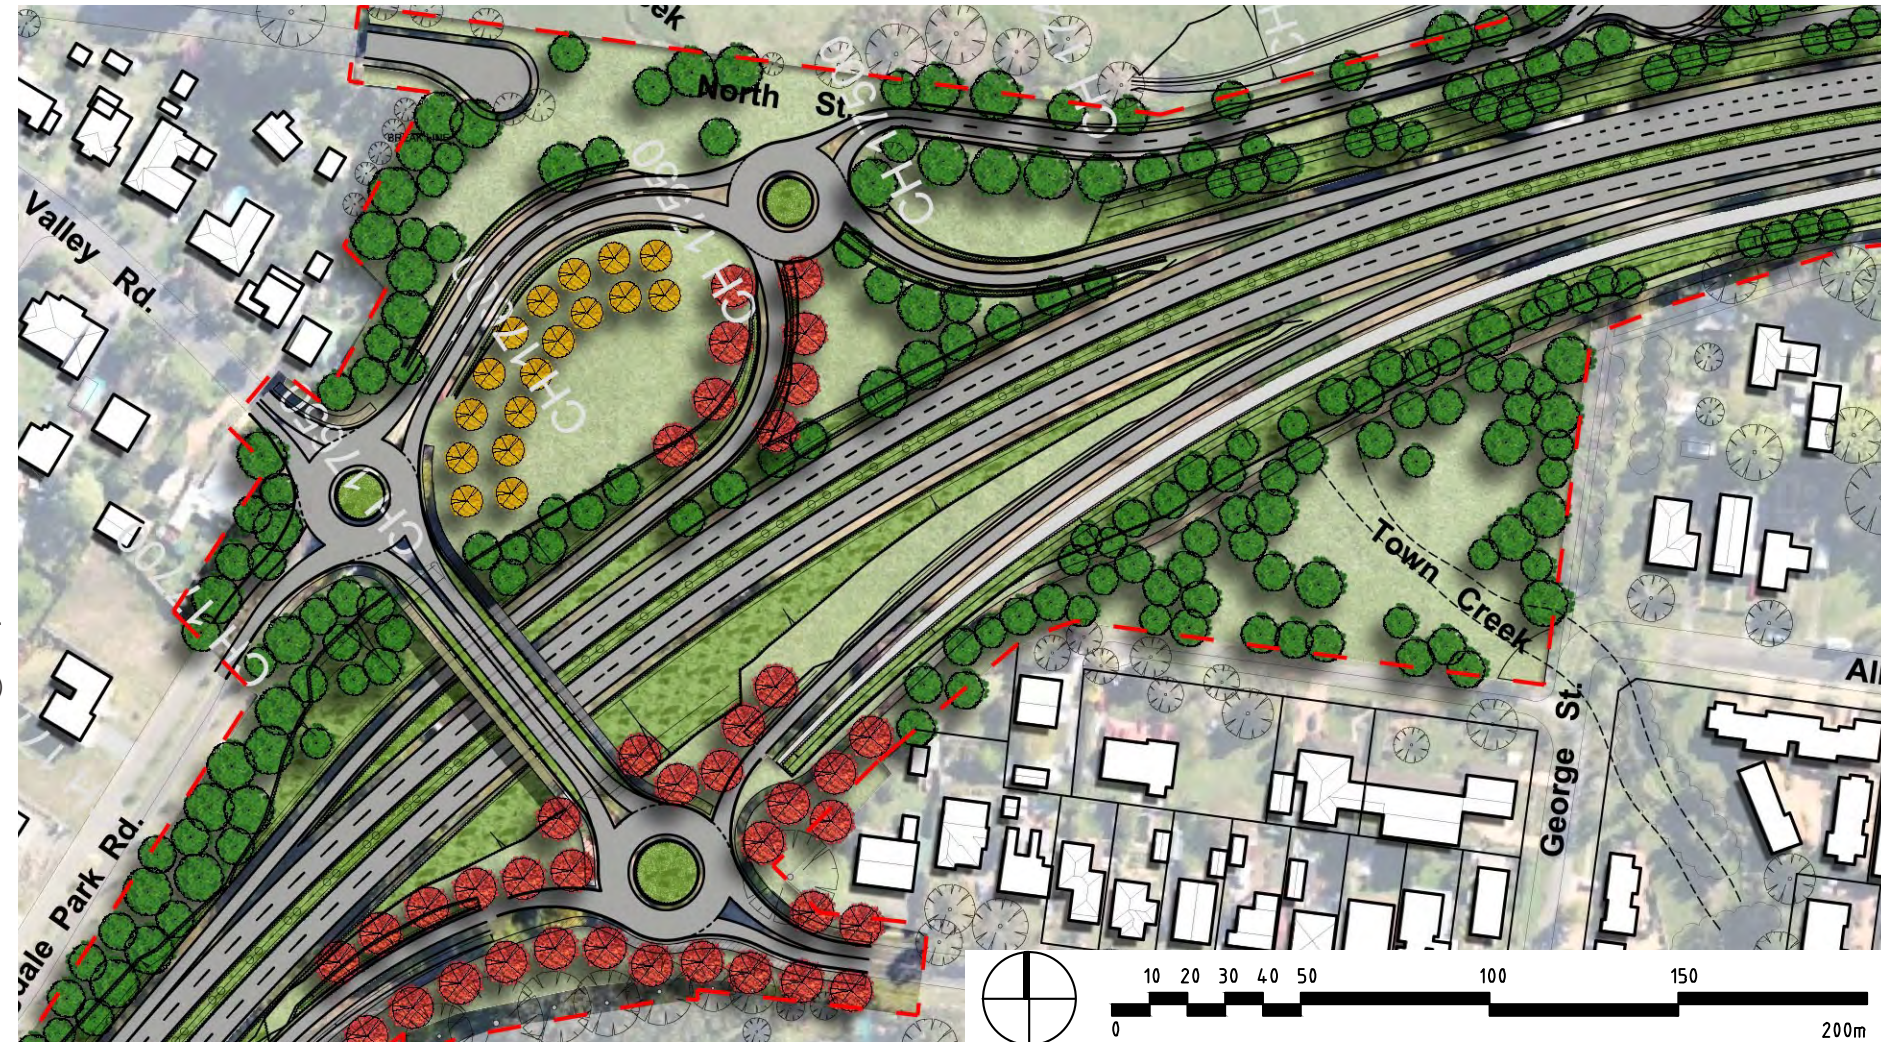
Kangaroo Valley Road Interchange typical landscape plan.
